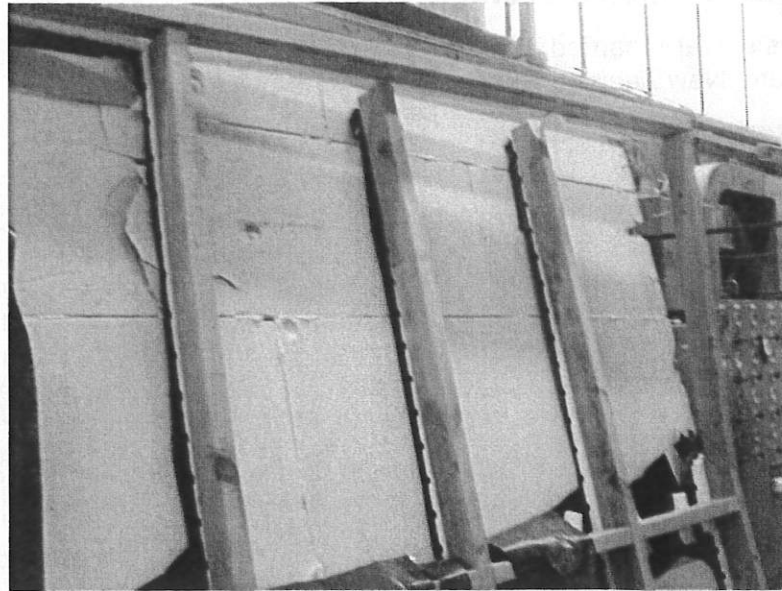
General photograph of specimen construction and failure modes taken after the test. (The black polythene sheet used as a seal between battens and framing has been partially removed.)
